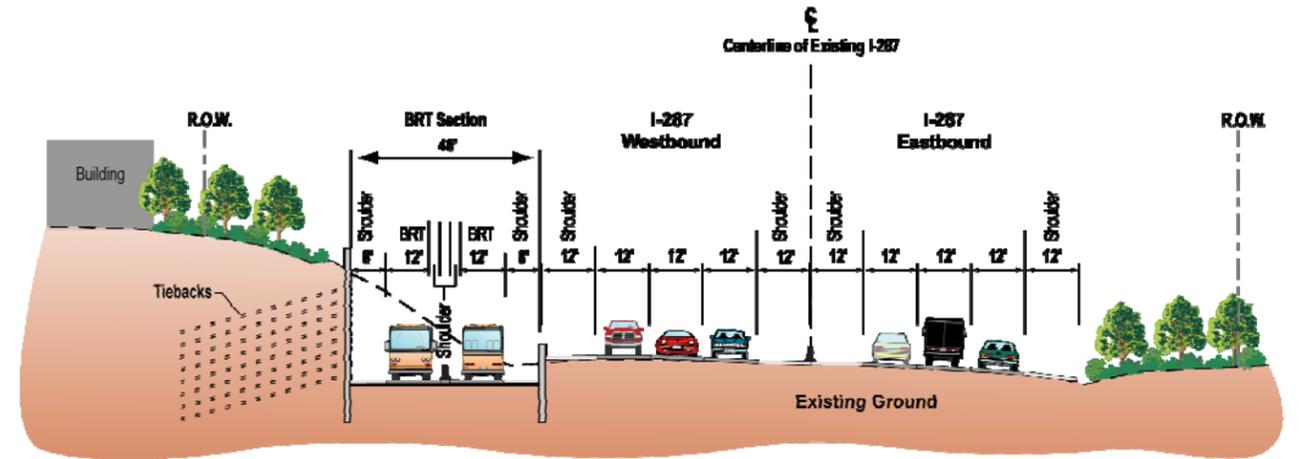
Bus Lanes (as a Busway) along North Side I-287 Cross-Section at South Ridge Street
